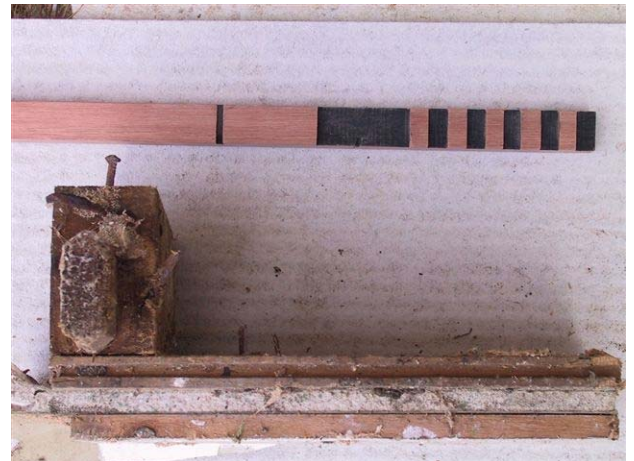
Cross-section showing wall and gib on wall stud in eastern end of cottage
